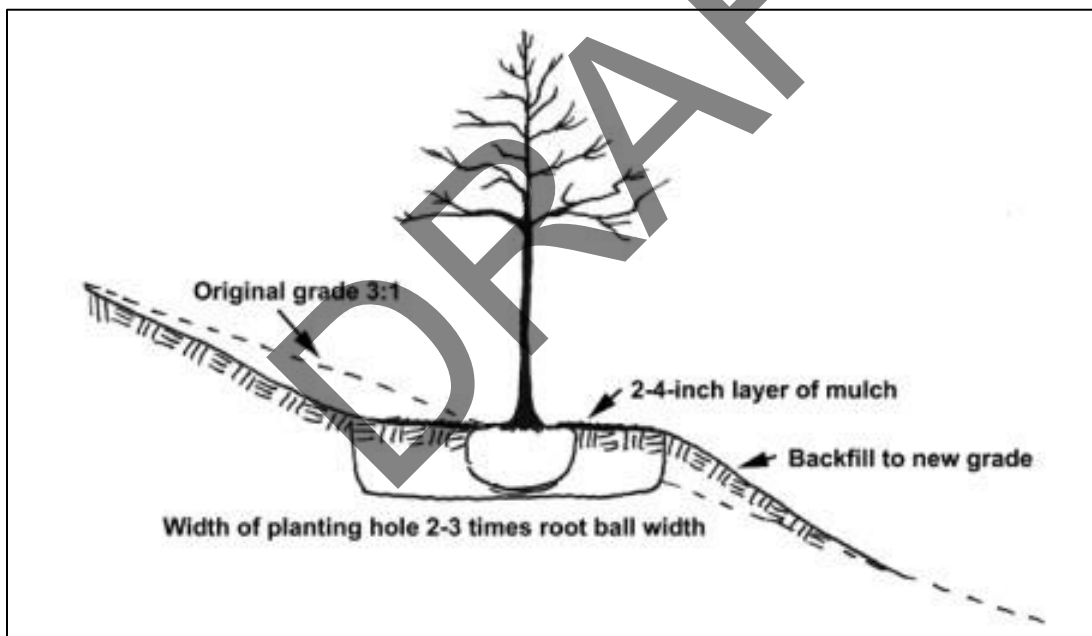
Trees planted on steep slopes require a constructed level planting surface.
